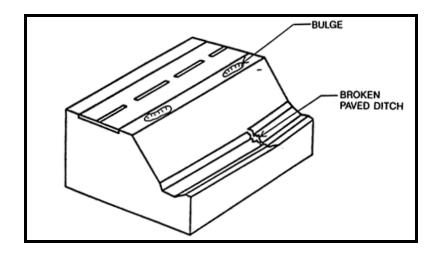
Bulge of pavement and broken paved ditch (FHWA, 1988)
